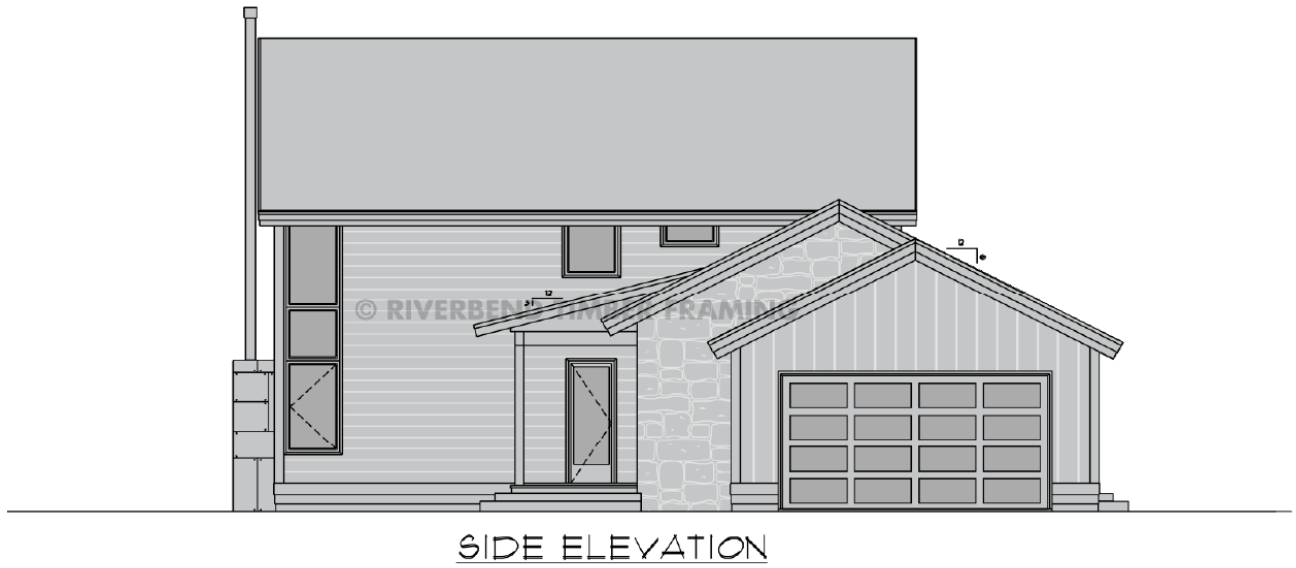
Side Elevation for Dwelling on Severed Lot (Source: Brauer Homes)
